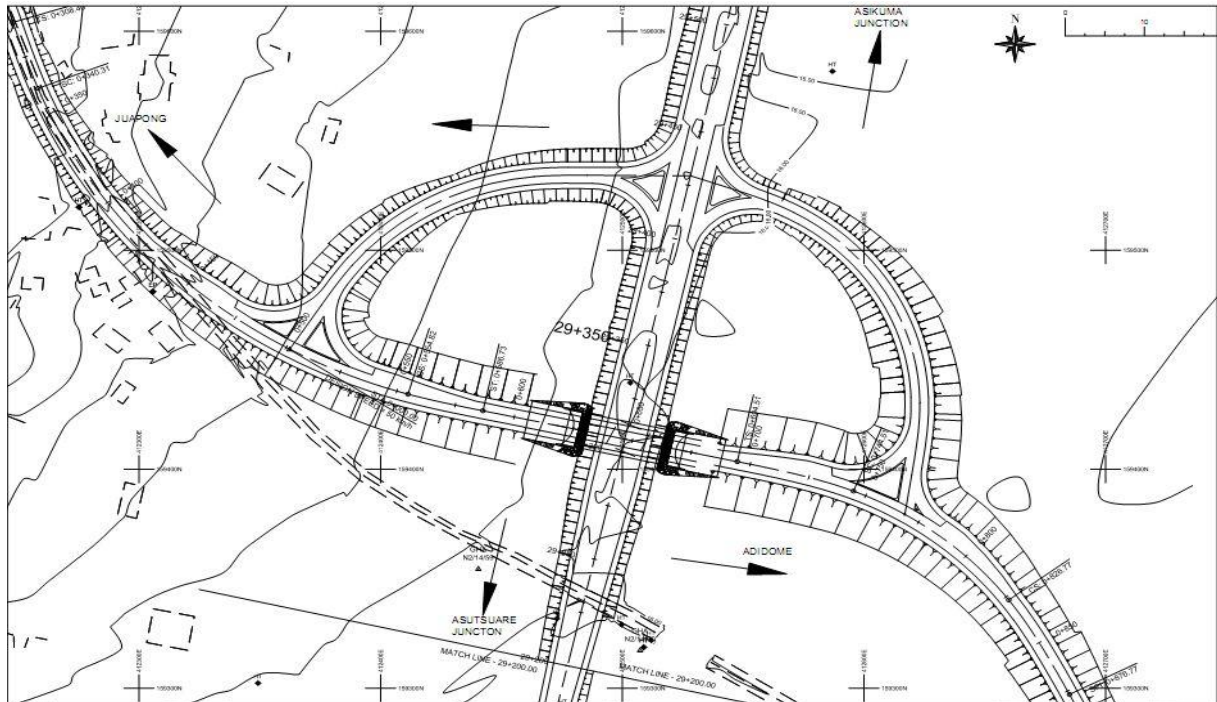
Layout of Dufor Adidome Interchange CH. 29+350 on Section 3 Project Road
